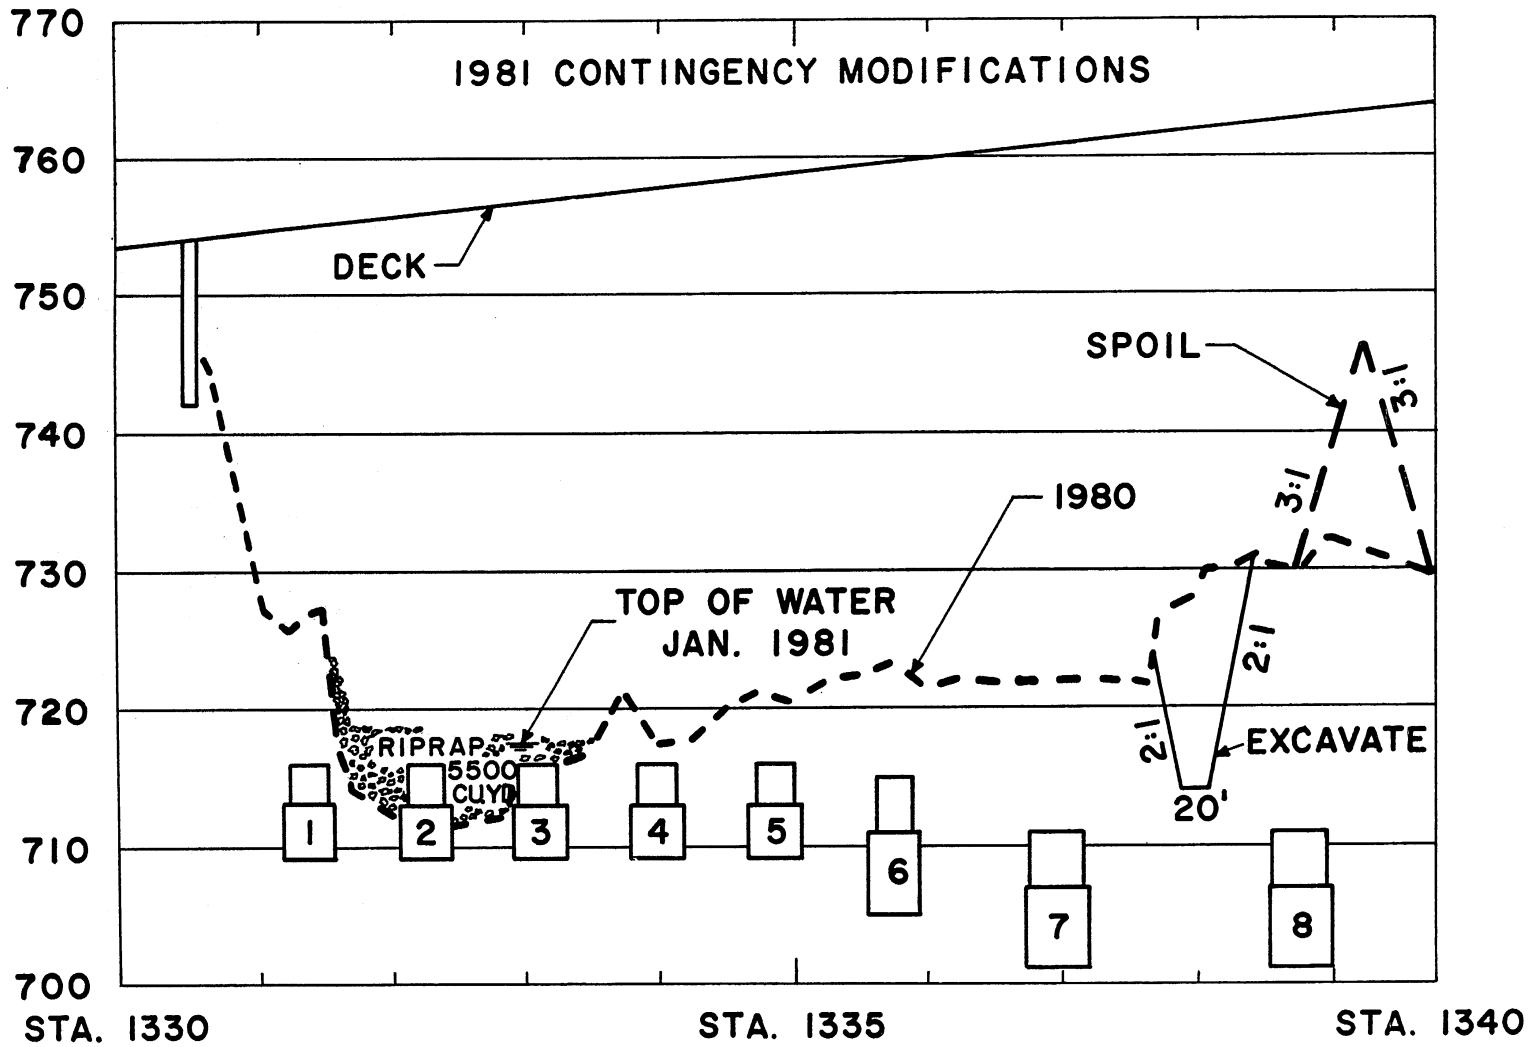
Sketch of the contingency measures (riprap and excavation of pilot channel) implemented in the summer of 1981. The left side is the west side. Elevation is in feet above sea level.
